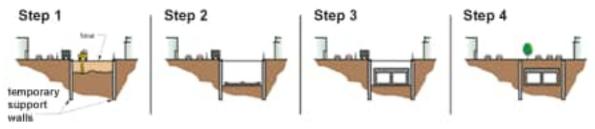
Examples of Bottom Up Construction at Woodlands South Worksite [W-7]
